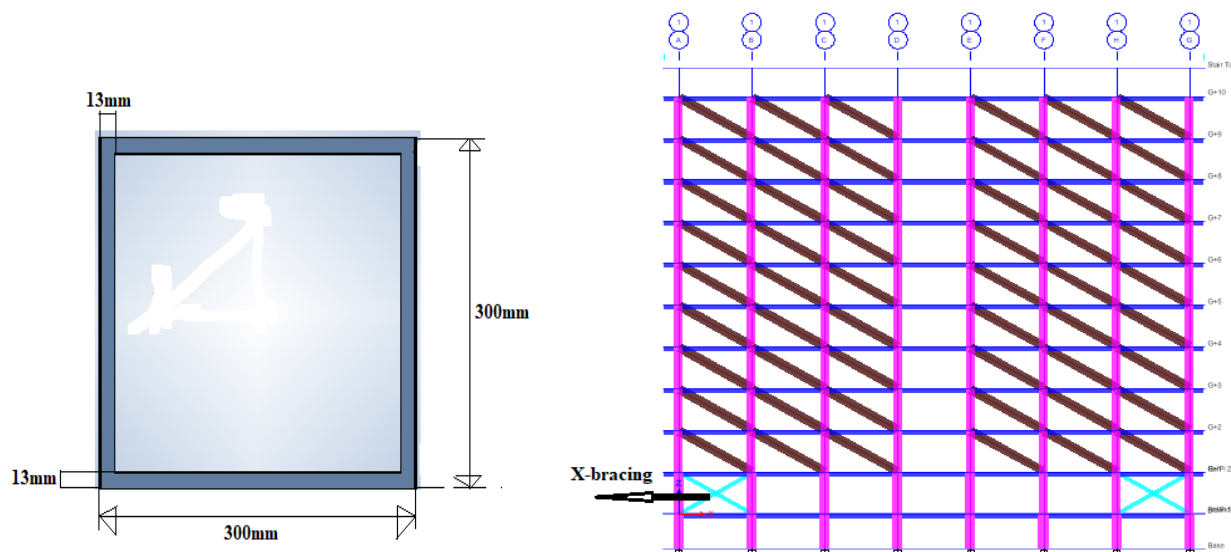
25 Cross-sectional dimension of X-steel bracing used and strengthening of soft storey
